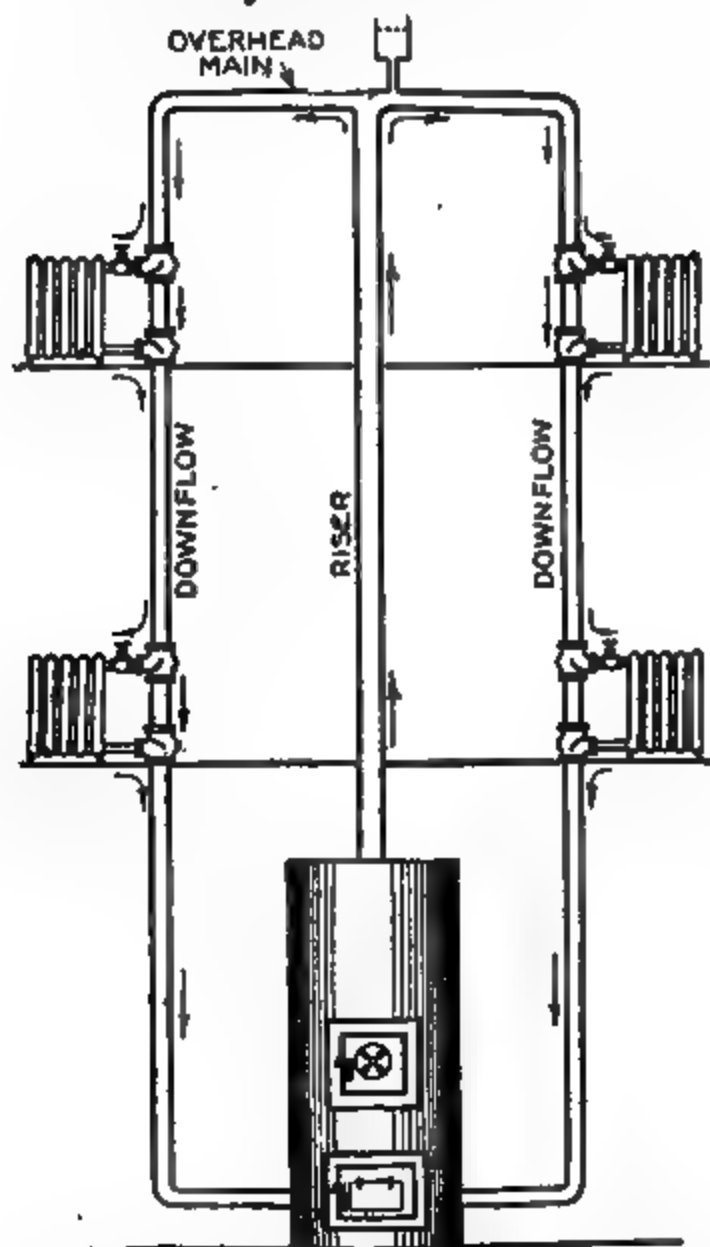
,419.—Overhead system. It is considered by some as the best method of piping. Although it is not adapted to all classes of buildings, there are many, such as apartments, stores, office buildings, hotels, etc., where the general arrangement lends itself to this system. No air vents are necessary at any point on the system, as the arrangement is such that all air works to the top and passes off into the expansion tank.
